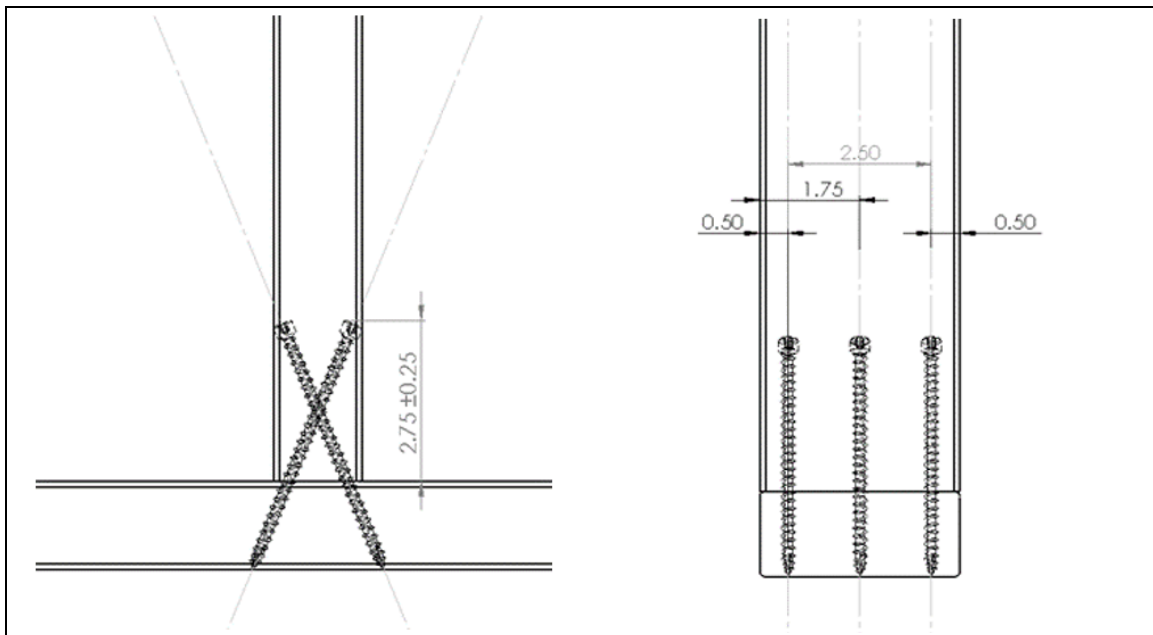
Stud to Bottom Plate – 22.5° (Angle), One 4 1/2" TRX Truss Screw Option
